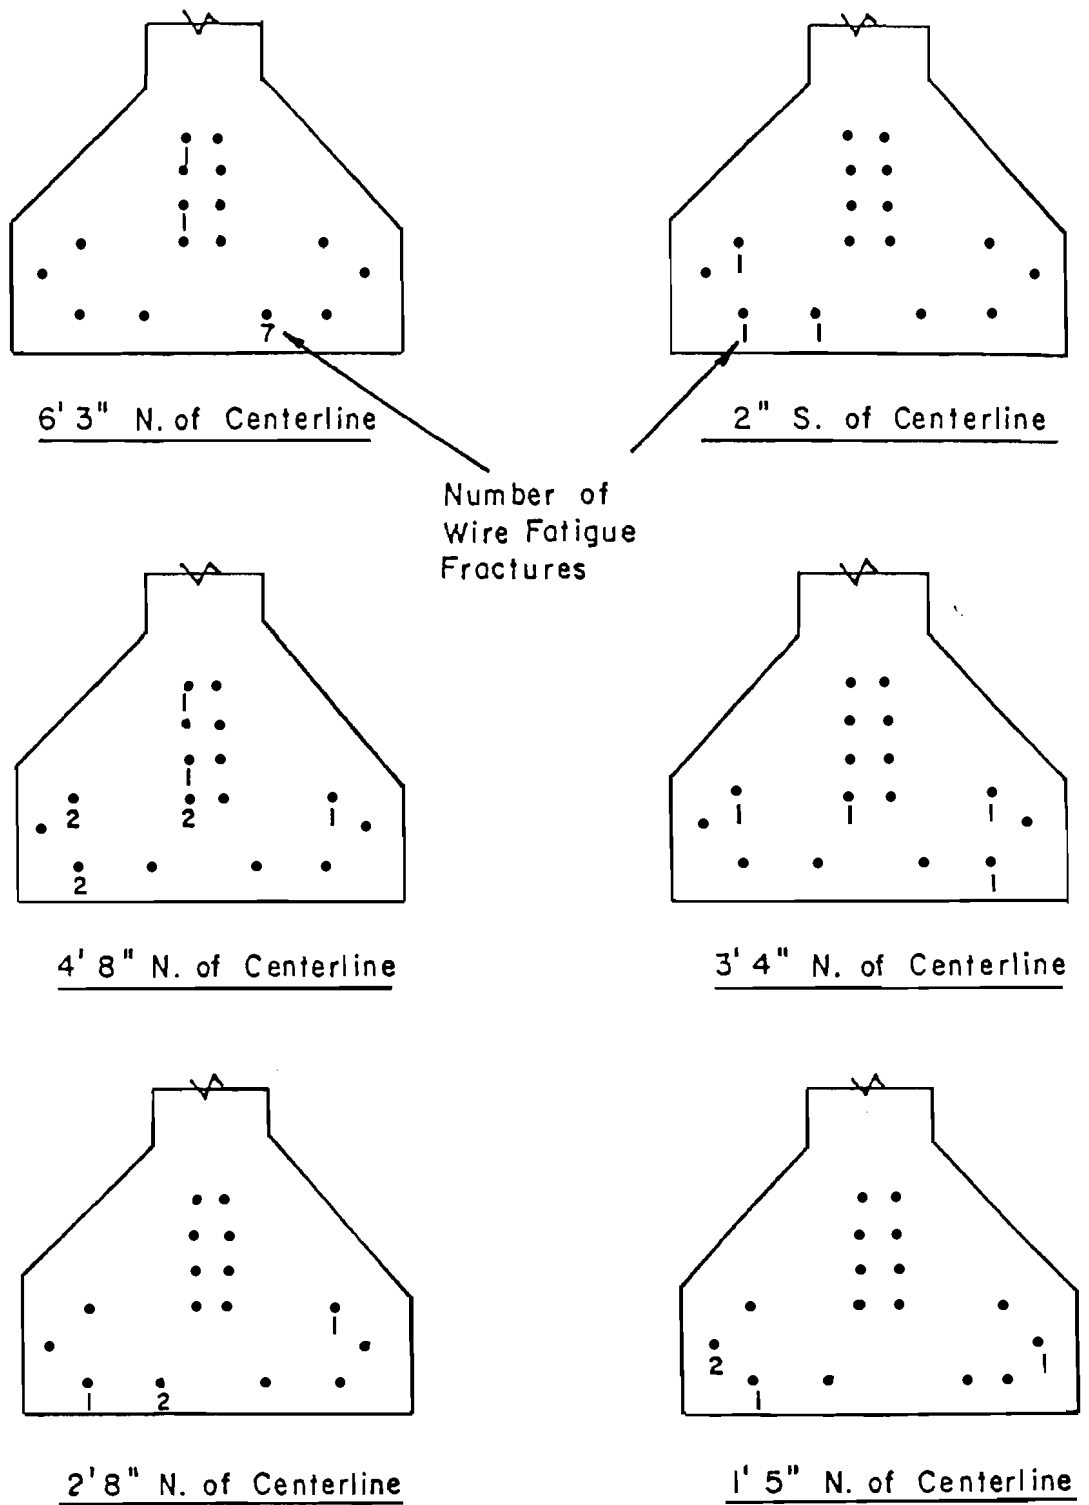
Fatigue fracture locations for Specimen C-16-NP-10.5-NO-0.58
